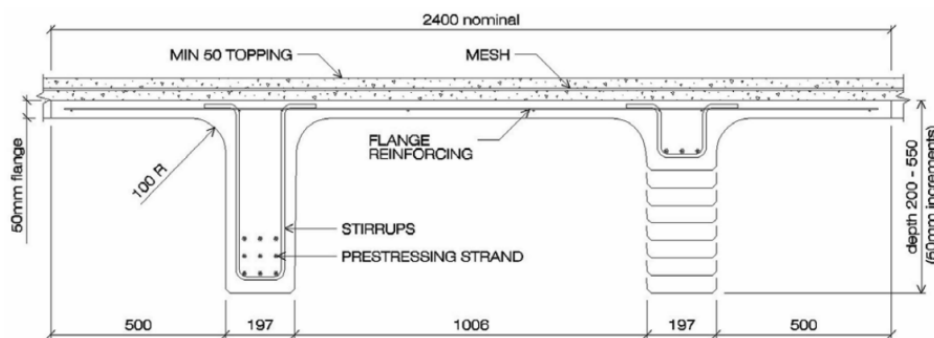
Cross-Section Dimensions of Concrete Double “T”
